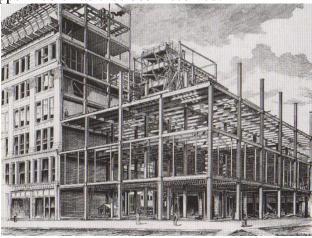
Construction Site View, Faire Store, William Le Baron Jenney, 1891.
